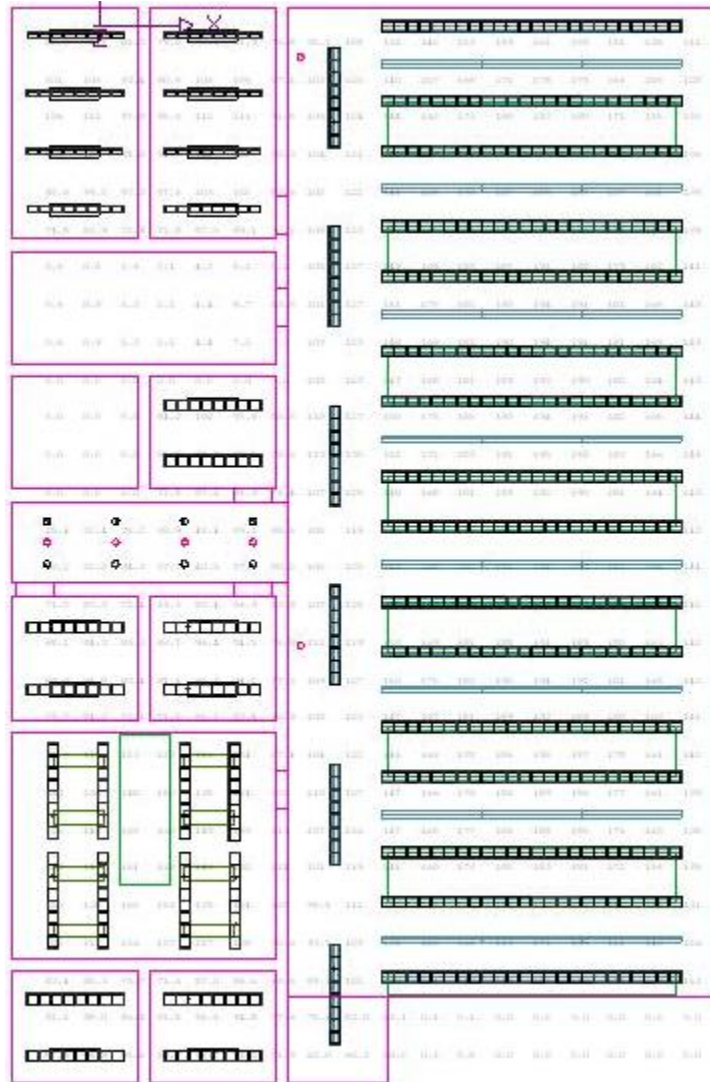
Lighting Layout for Laboratory 285, New Design
